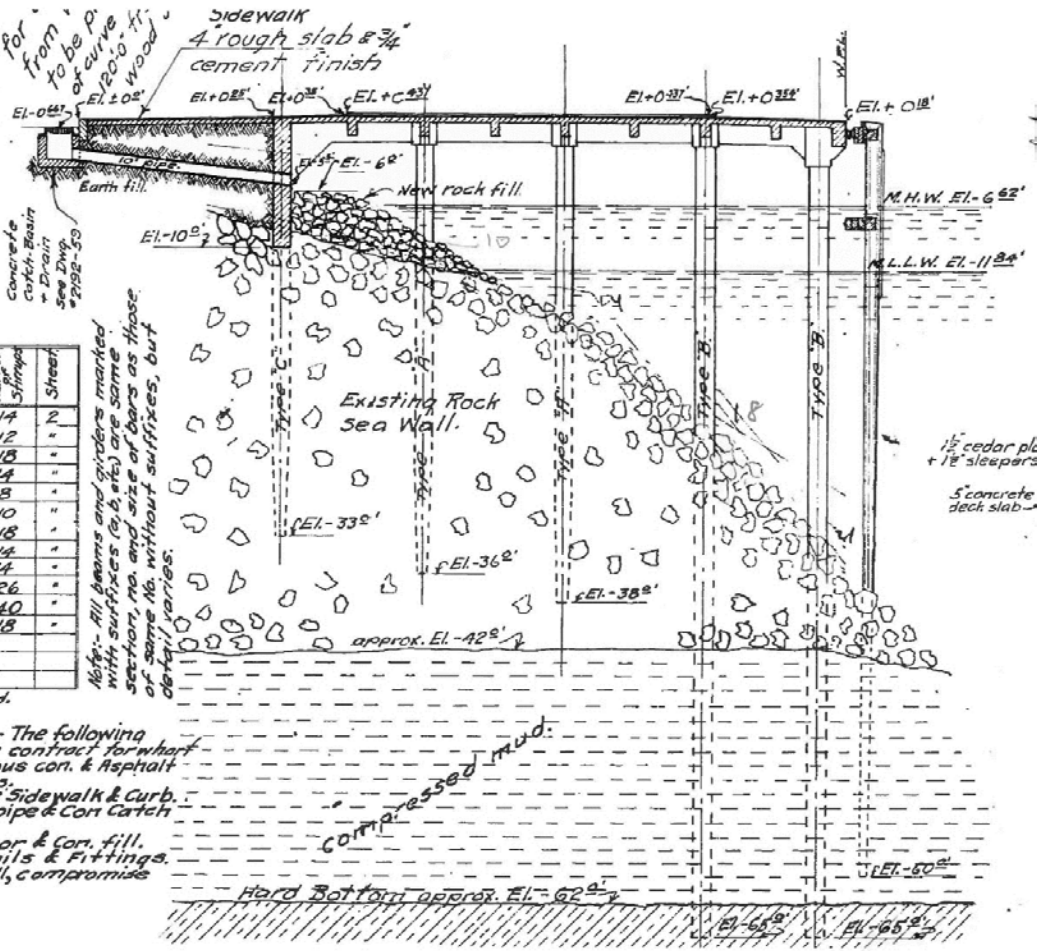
Section 6 Bulkhead Wharf Near Pier 9 –Section View (Port Drawing 2781-9-1)
